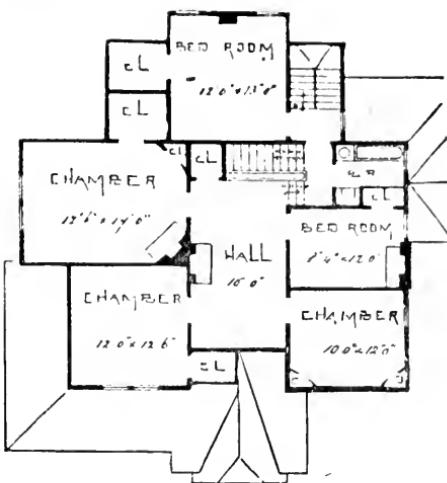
Plate XVII.*PAIR OF HOUSES AT BRIDGEPORT, CONN.
